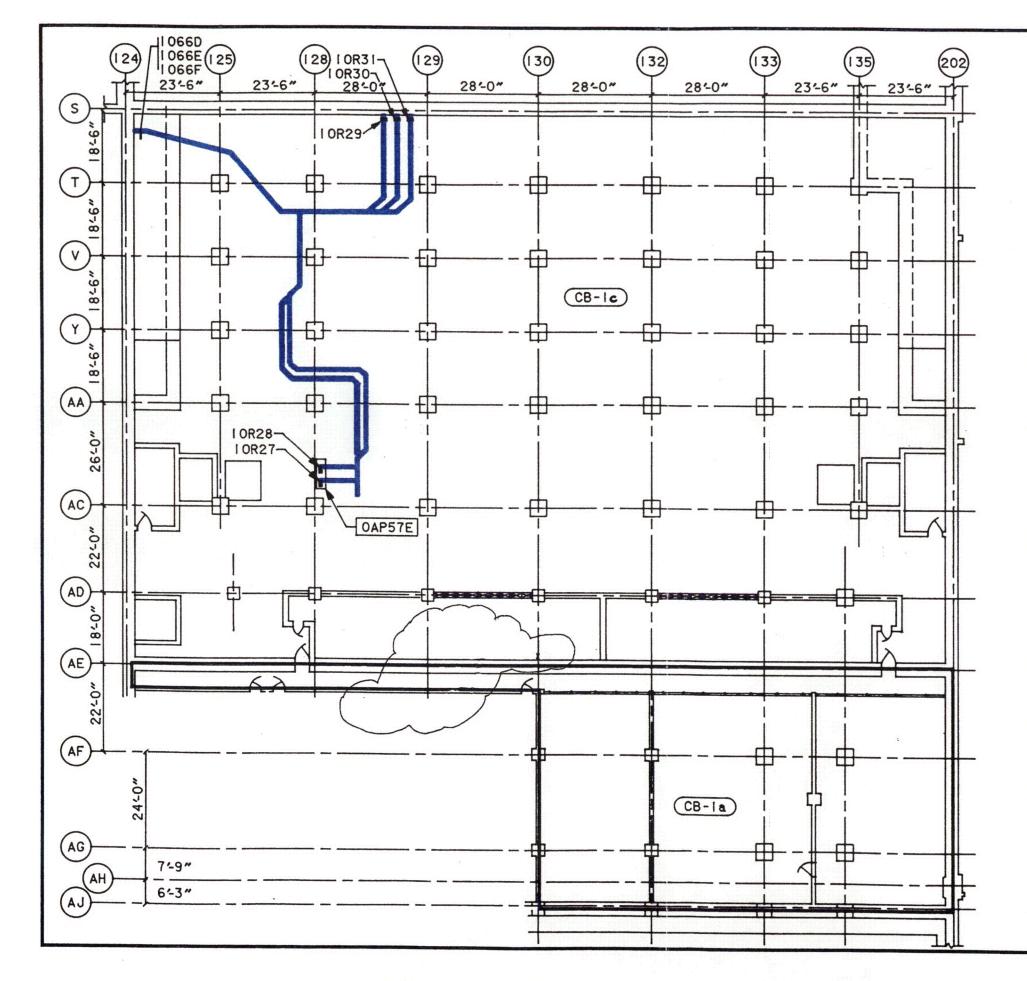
FIRE PROTECTION DEVIATION AUXILIARY BUILDING GRADE FLOOR PLAN EL.737'-0" FIRE AREA A-1
